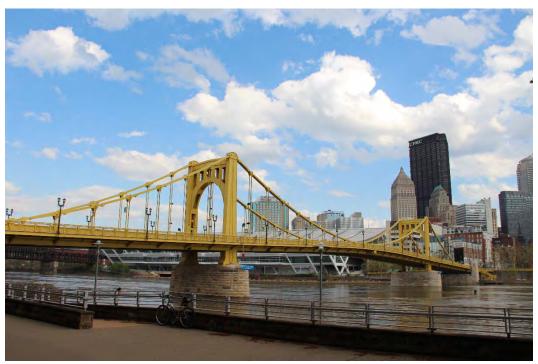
Rachel Carson Bridge (April 2024), overview of west elevation from north end of bridge, facing southeast.
